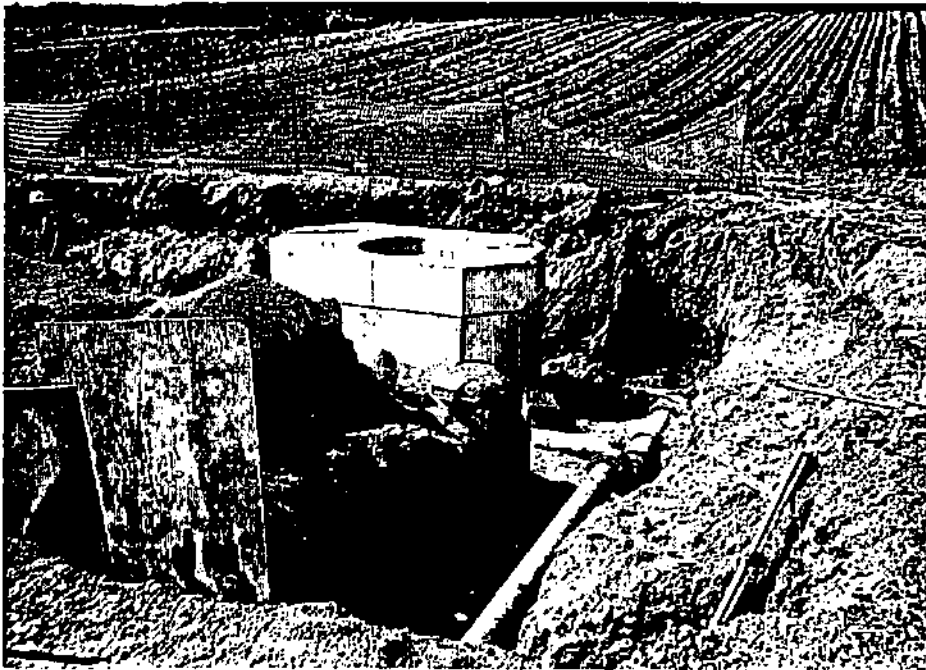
North Bloomfield, N.Y. 7/16/87. A water main connection to be the by-pass system, and a meter vault on Martin Road.
